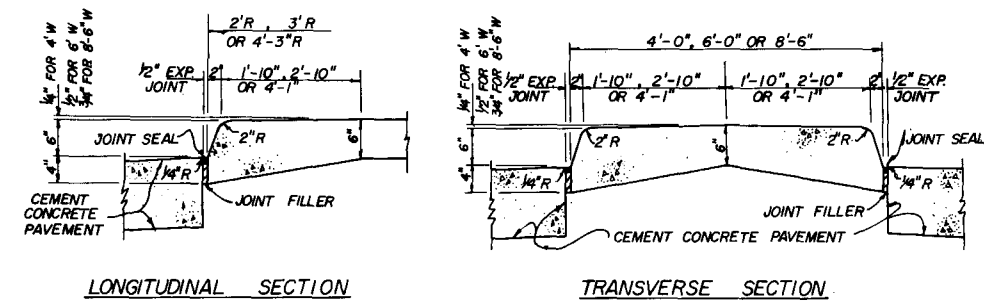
DETAILS OF TYPE I CONCRETE TRAFFIC SEPARATOR
